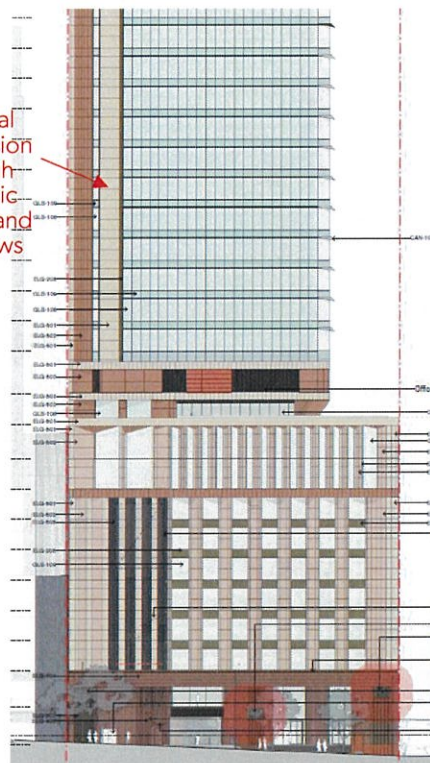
| Part elevation (Elizabeth Street) showing corner treatment with vertical re-entrant (Source: Applicant's RtS)
